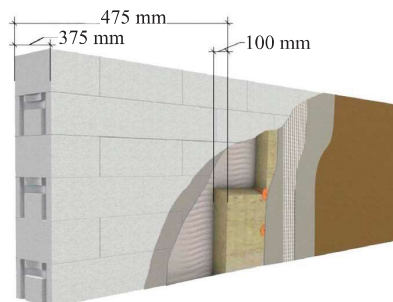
Option 2.1 – external wall of aerated concrete D500 and 300 mm wide with insulation of mineral wool boards 100 mm thick
